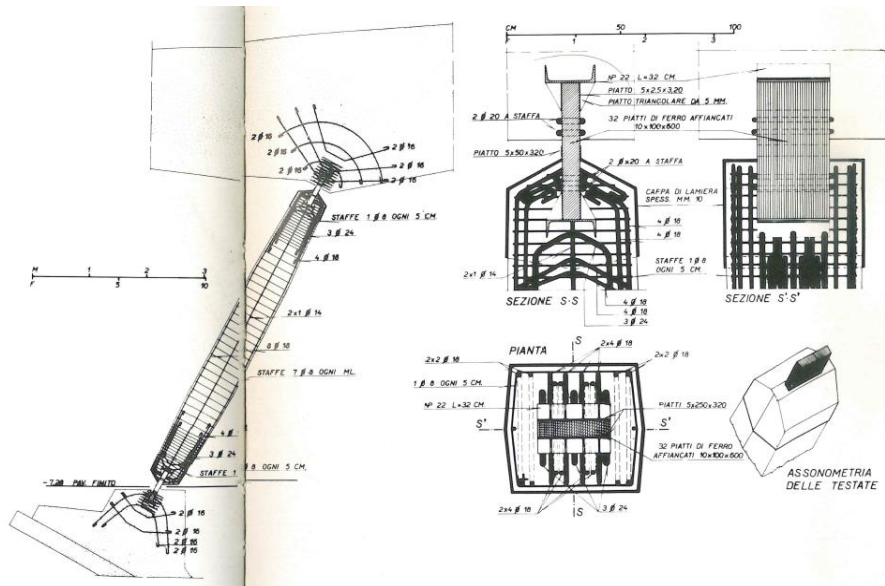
Construction details of the inclined longer strut beams and the connection elements with the ribs (Boaga, 1984)
